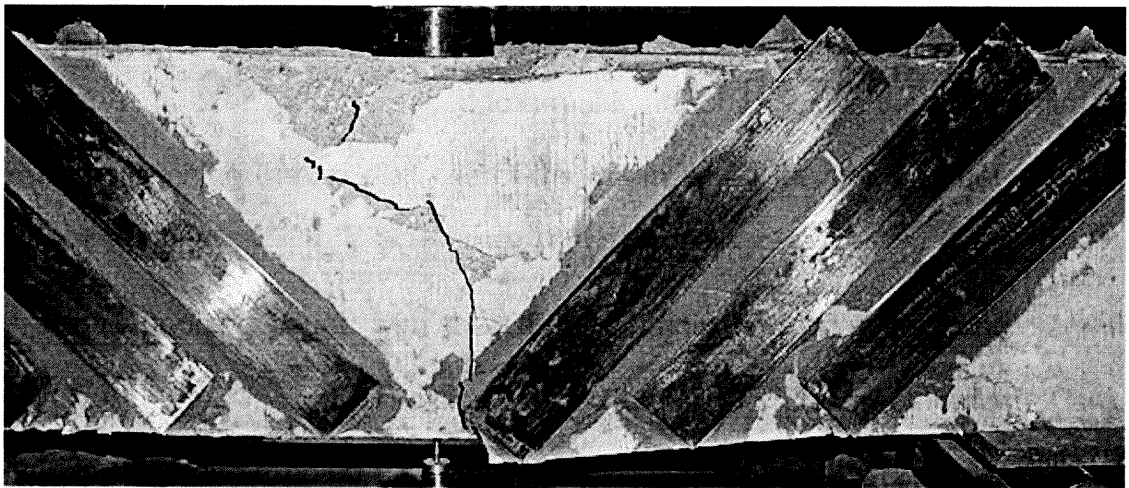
Failure of beam 1-4 with 45 degree aligned CFRP
